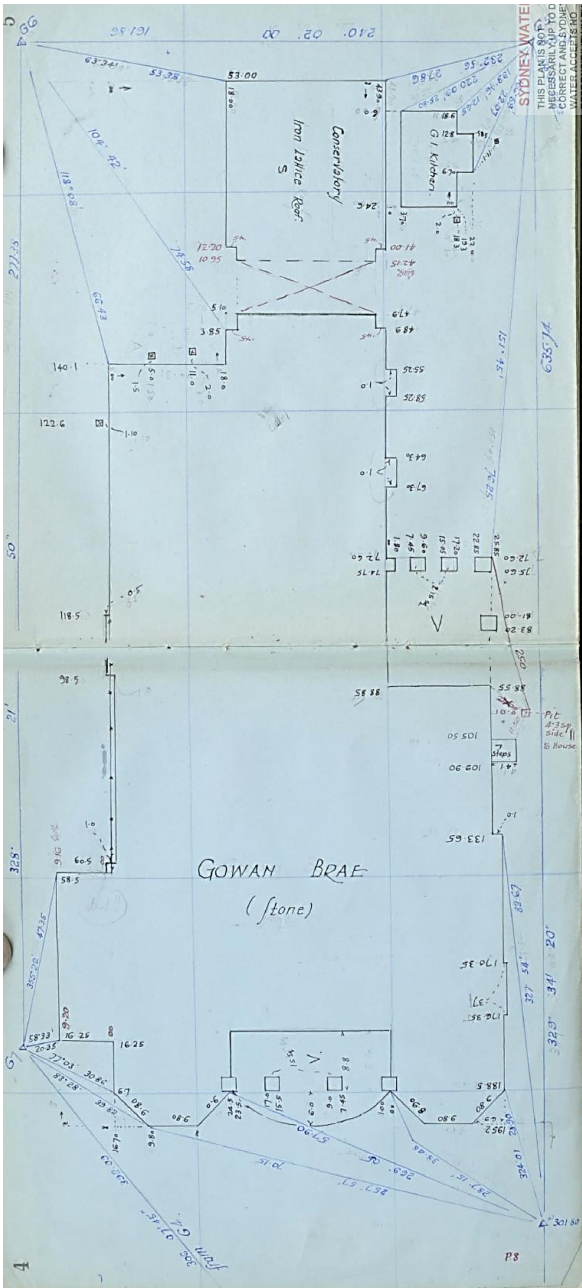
1942 detail sheet indicating footprint of Gowan Brae House
